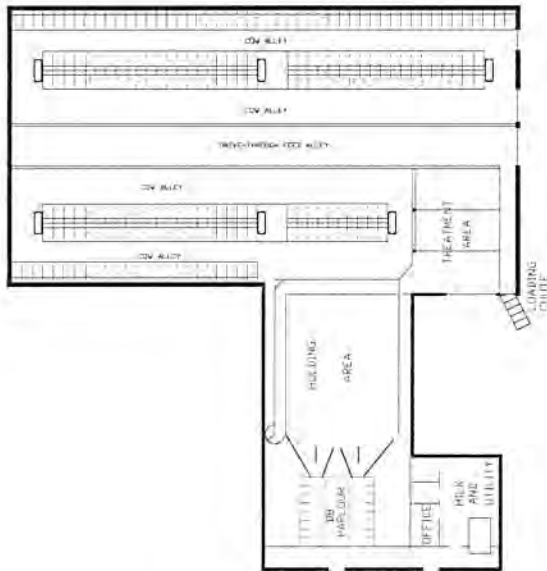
A. Layout permits dairy barn expansion off barn to right, milking parlour (handling facility) to the bottom.
